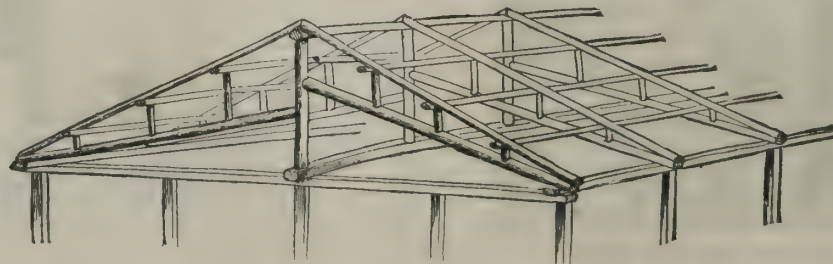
ROOF FRAME OF LARGE BUILDING.
